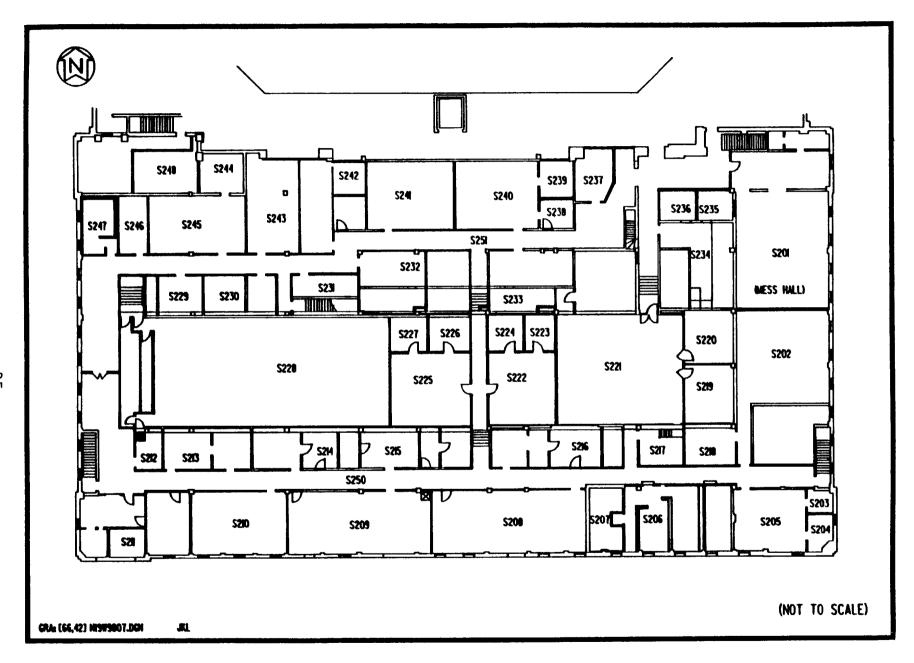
PLAN OF THE SECOND FLOOR - SOUTH HEADHOUSE
